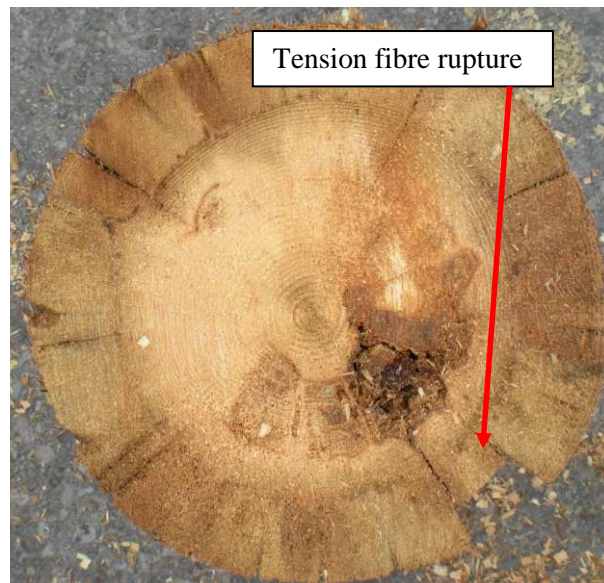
Cross-section of in-service control specimen (D-3-2).
